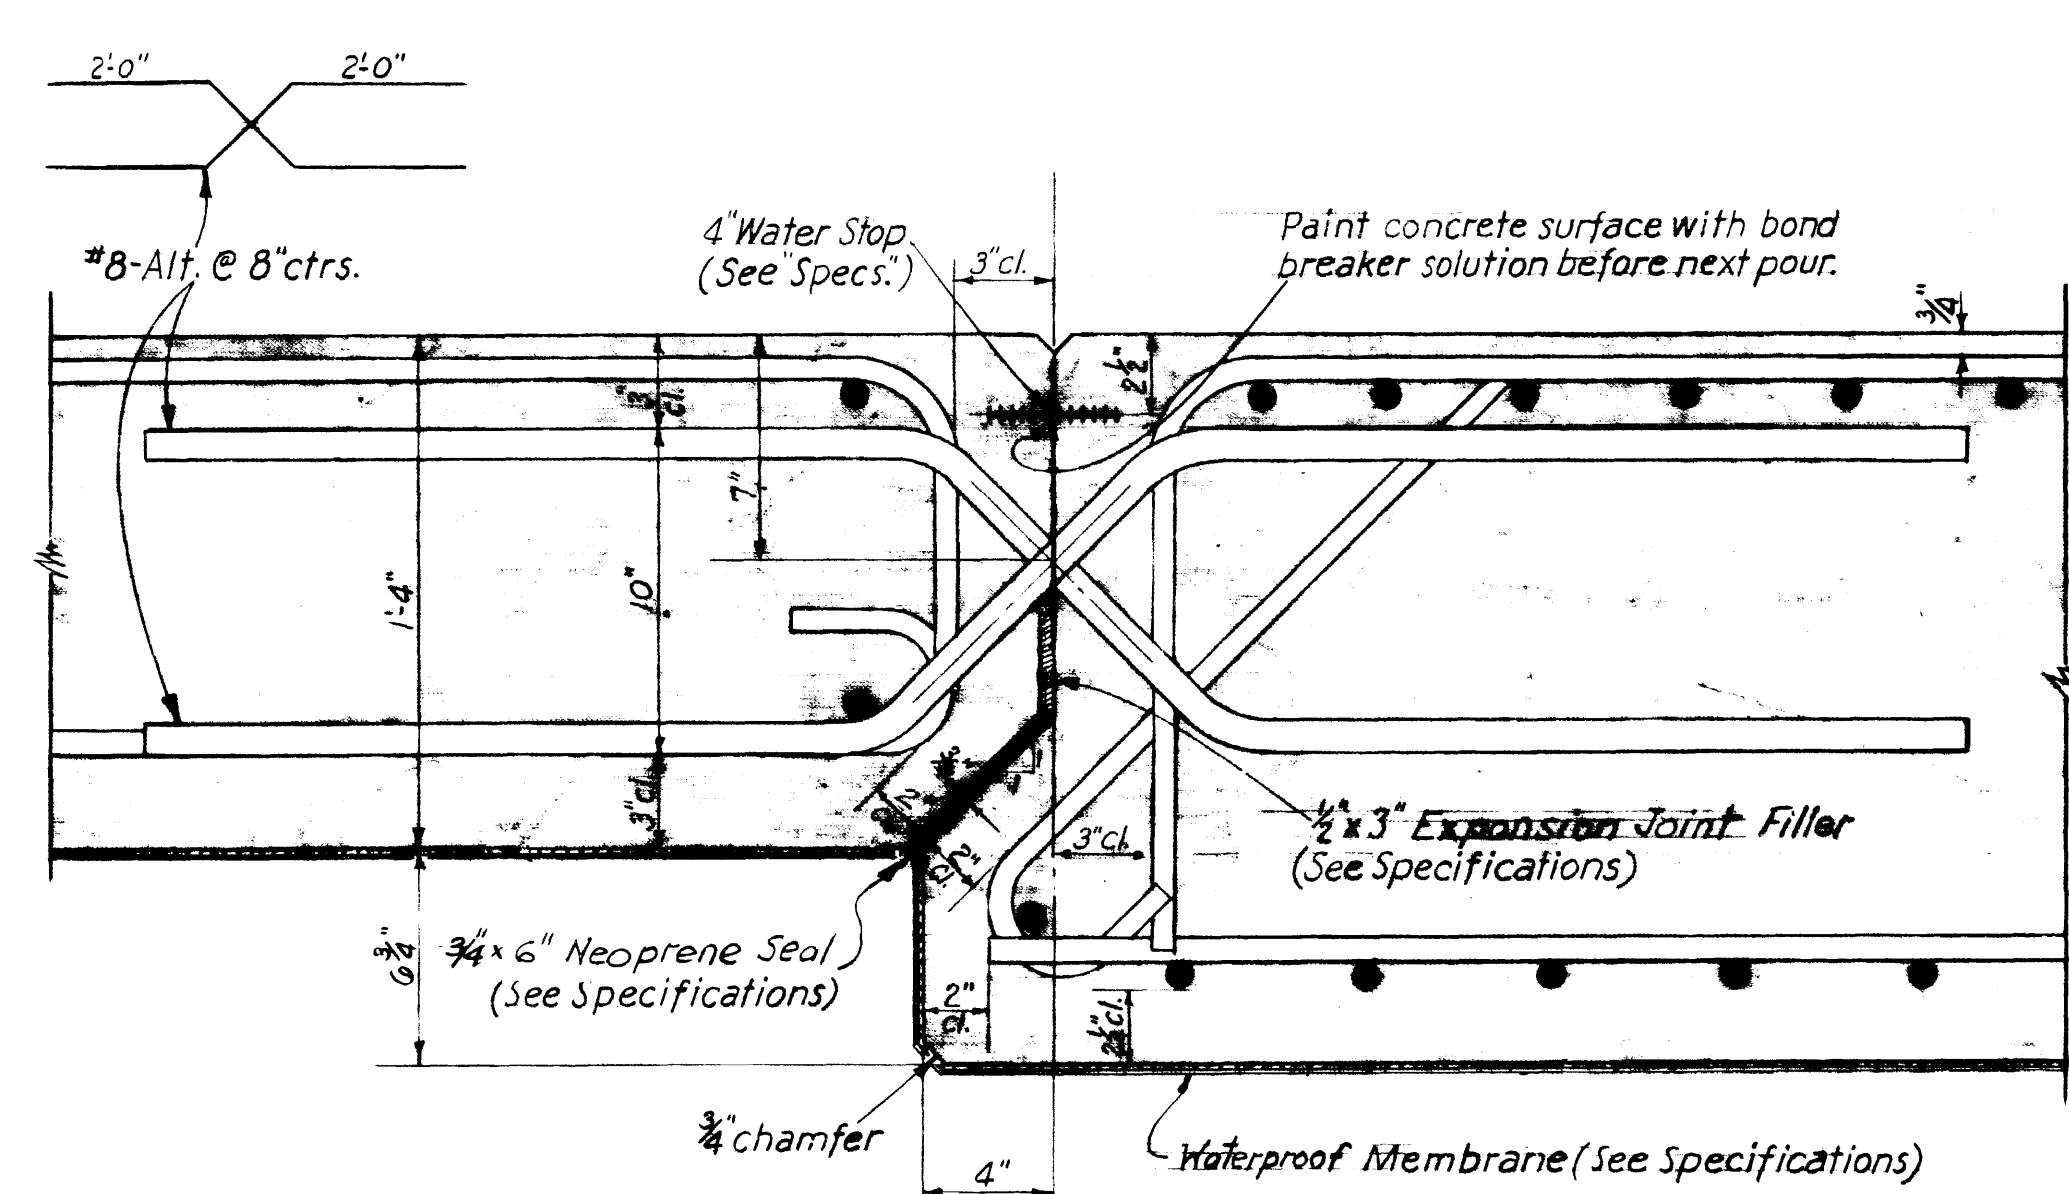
DETAIL OF BEAMS ALONG LINES (P) & (Q) - SOUTH DECK
